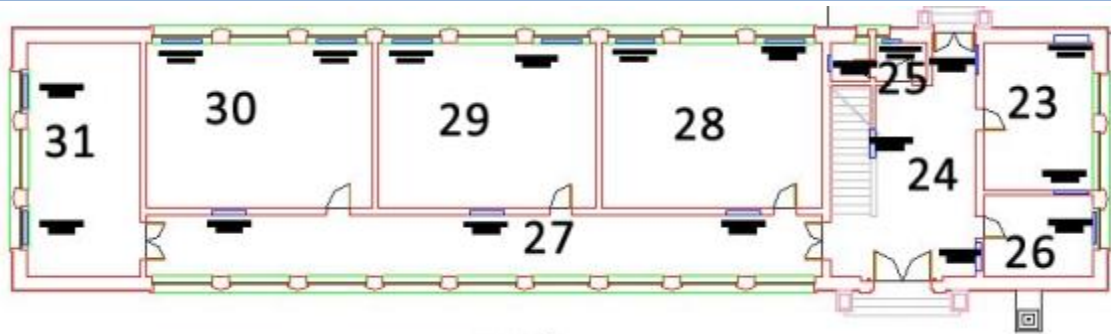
ROOMS USE IN BLOCK 2, FLOOR 0
